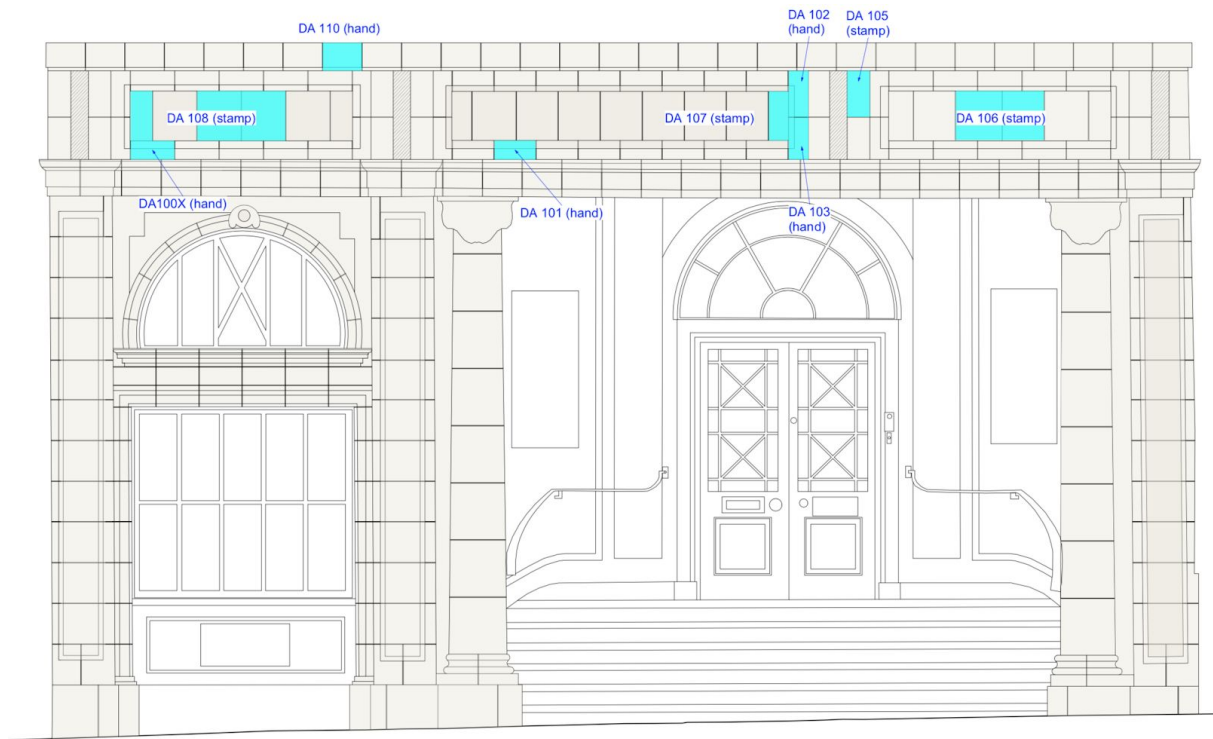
Location of identified lapels (stamped or handwritten) on the faience pieces (base drawing © YCT).
